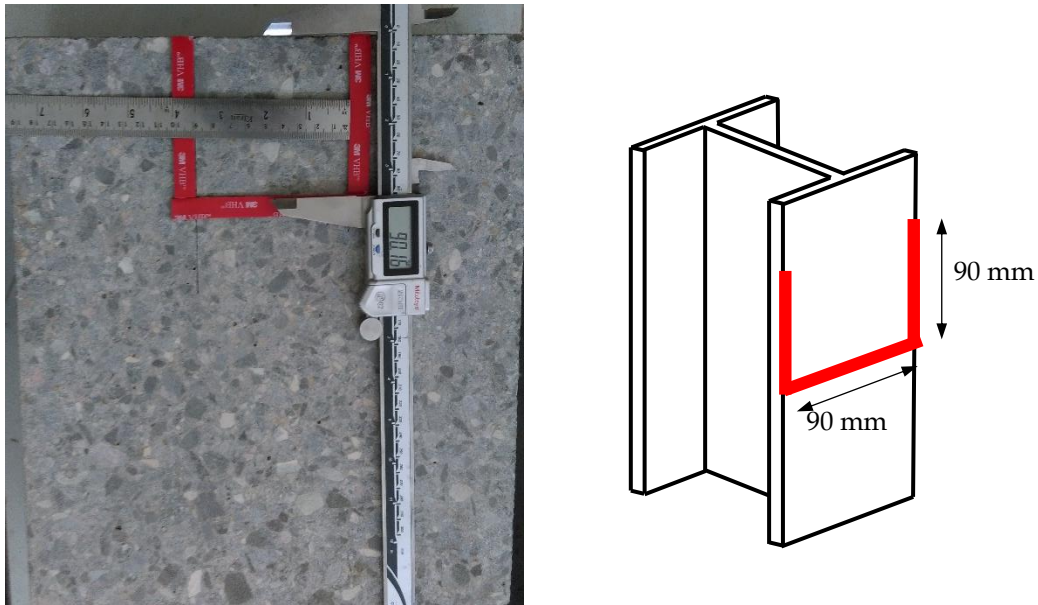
Prepared specimen; (a) concrete section prepared for adhesive bonding and (b) steel section prepared for bonding
